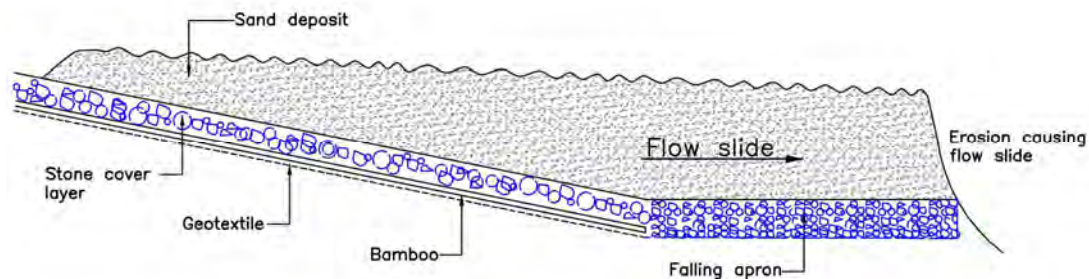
Flow slide of sand deposits on top of slope protection (SP) as possible cause of shifting of rock
